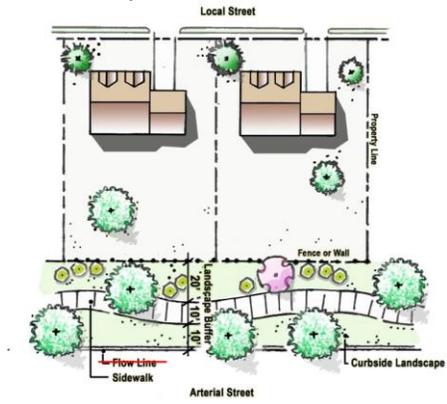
Arterial Street Frontage Buffer Measurement Detached Meandering Walk
